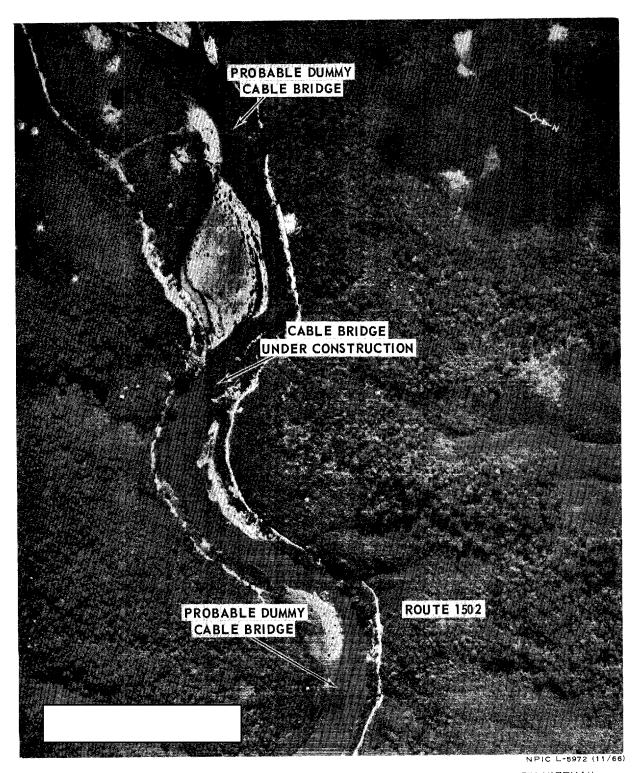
CABLE BRIDGE UNDER CONSTRUCTION, XOM CA TRANG AREA, NORTH VIETNAM
